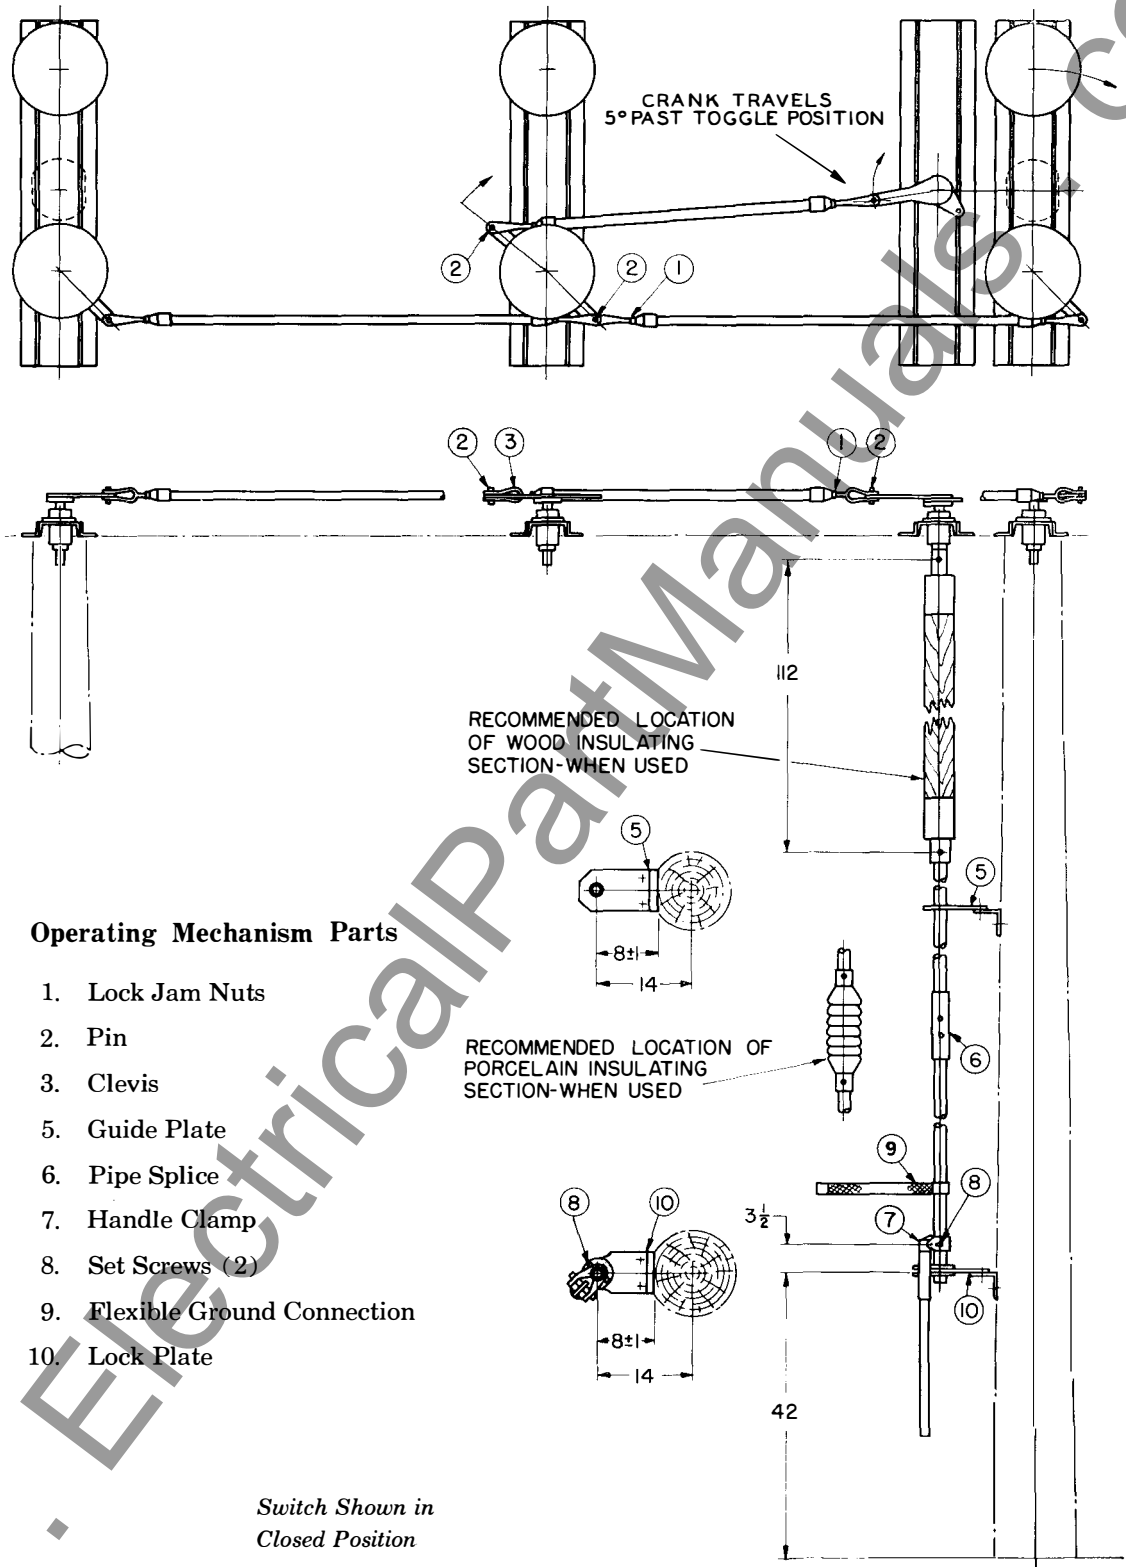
This is a typical installation where two wooden poles are used to mount the switch. Again an "offset" bearing or fourth base is used which allows the switch to be "locked" in the closed position by toggling the rotor arm of the "offset" bearing over center. This is a standard installation for 46 and 69 kv switches.
